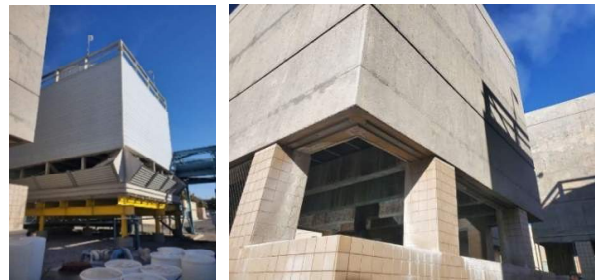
CENTRAL PLANT COOLING TOWERS
